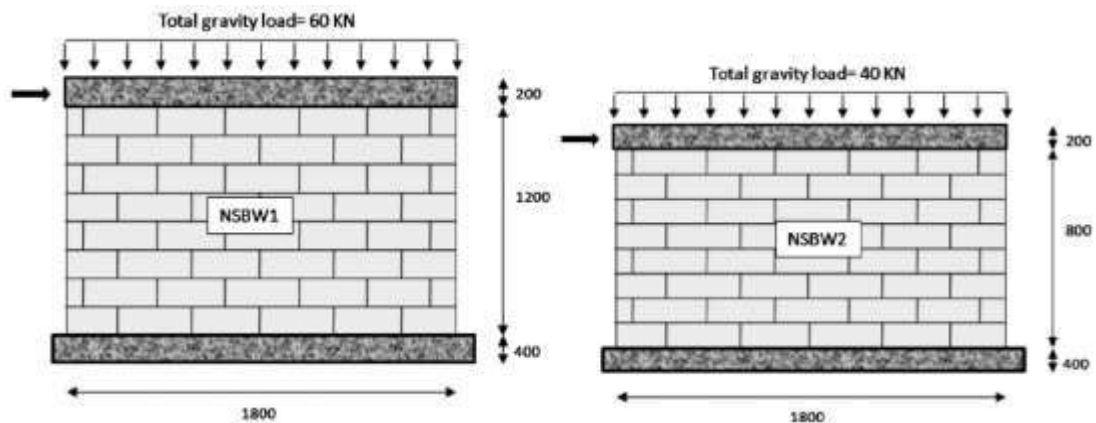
Basic URM wall specimens (Yaghoubifar, 2008)
